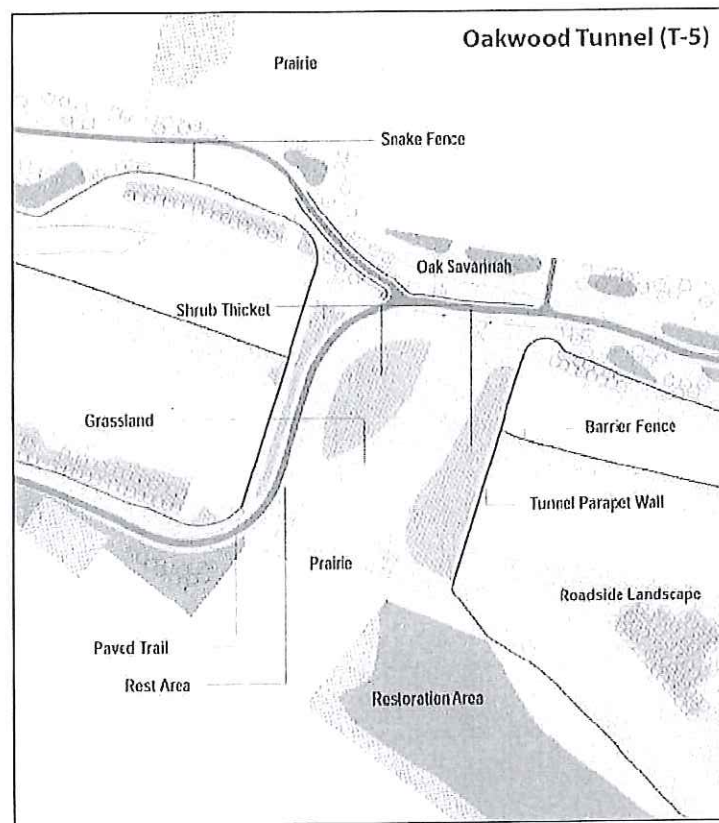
Oakwood Tunnel (T-5) (Source: www.hgparkway.ca)
